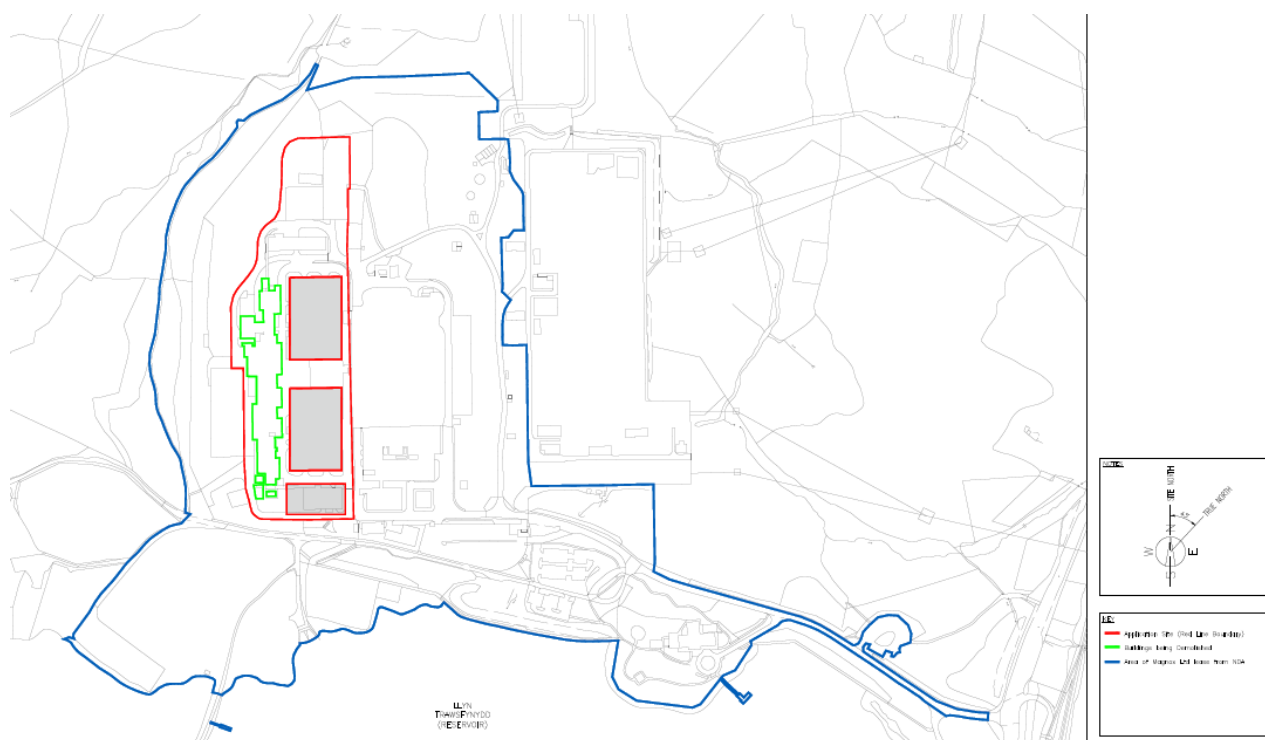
Site Location Plan (taken from drawing TRA-3210-LA-47775 Issue 01 submitted with the planning application).
